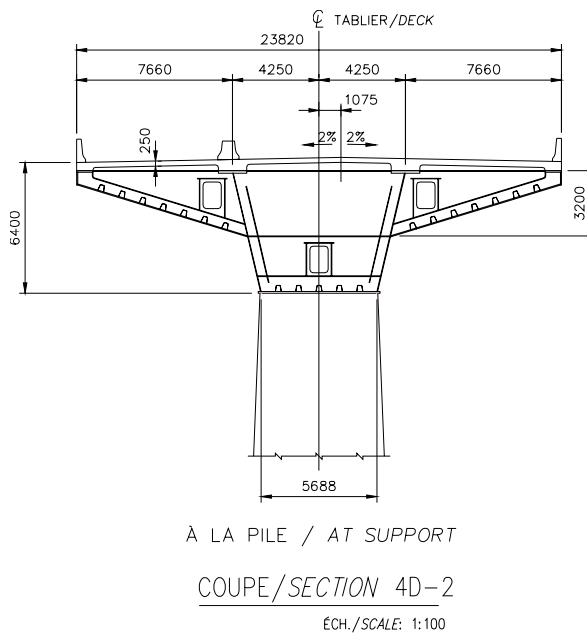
Cross-section– Mixed frame bridge with V-shaped piers – Closed single box girder
